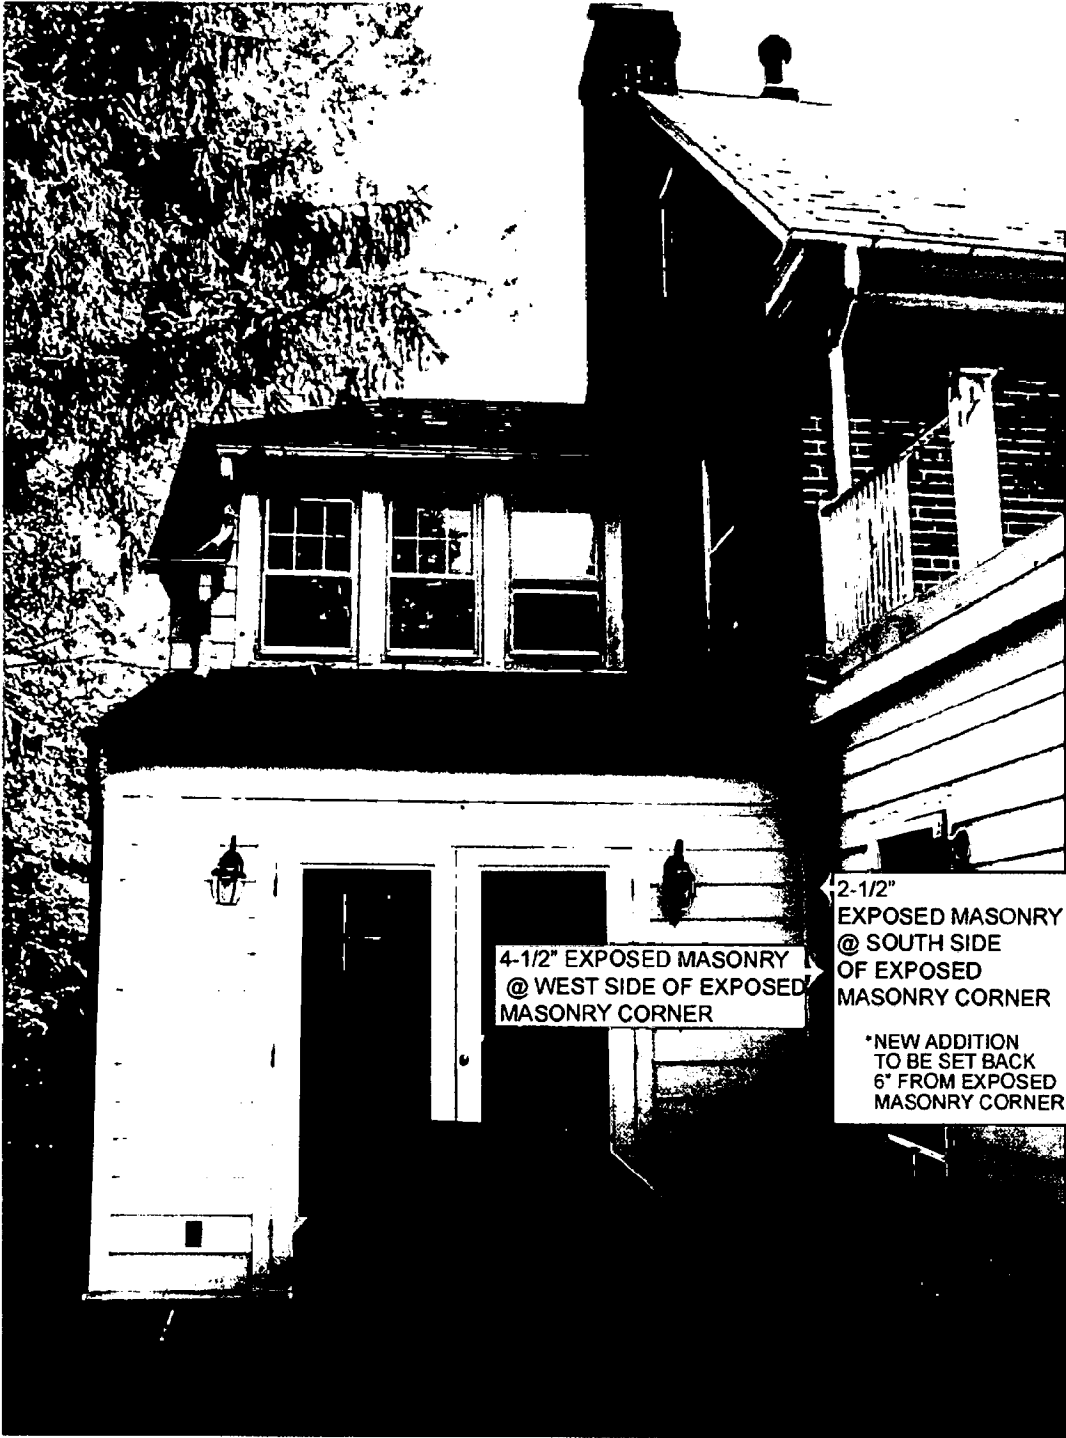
PHOTO - EXISTING SOUTHWEST CORNER OF HOUSE MASSING (MASONRY PORTION)
